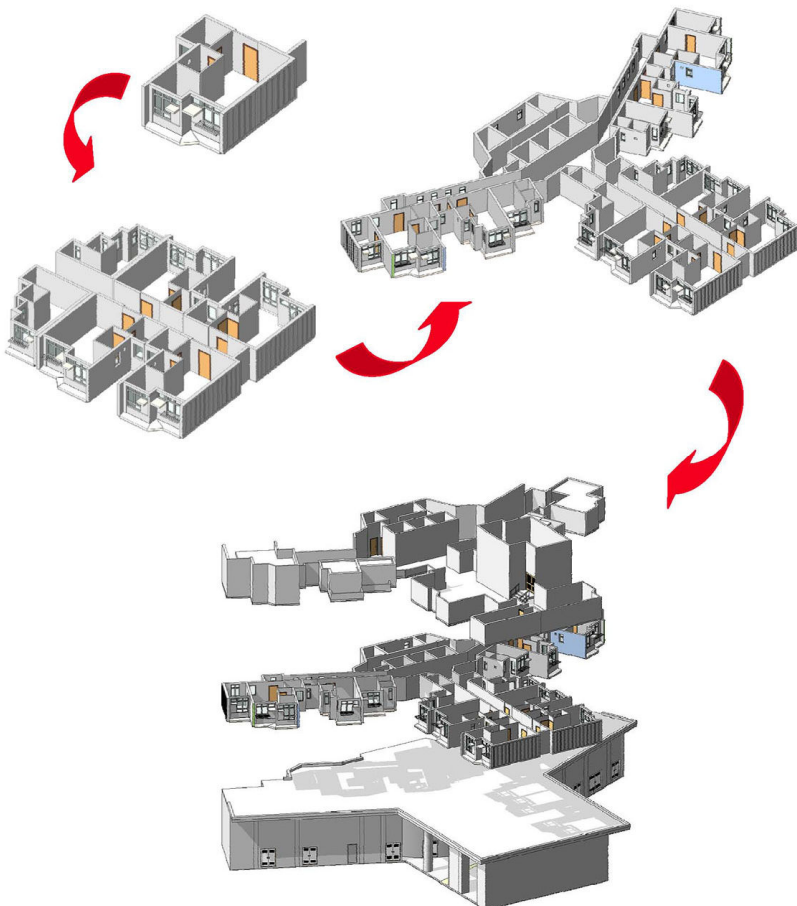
Assemble Standard Modular Flats to form Building Wing(s) / Floor(s)
